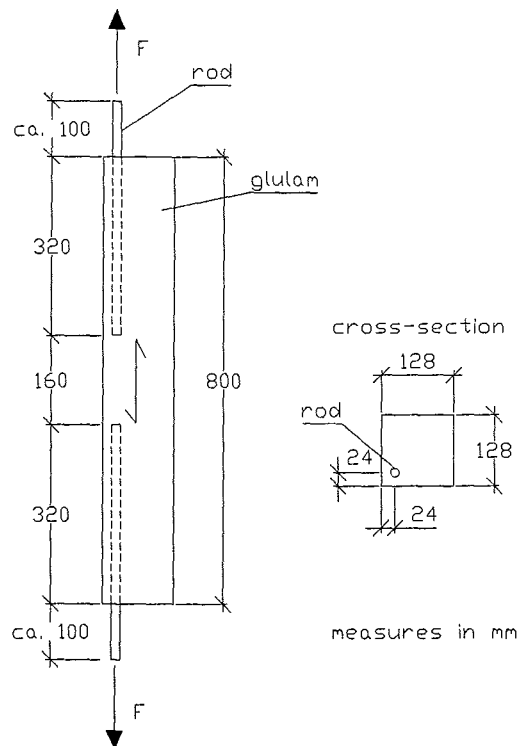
Dimensions and design of the specimens for preliminary tests with one rod
